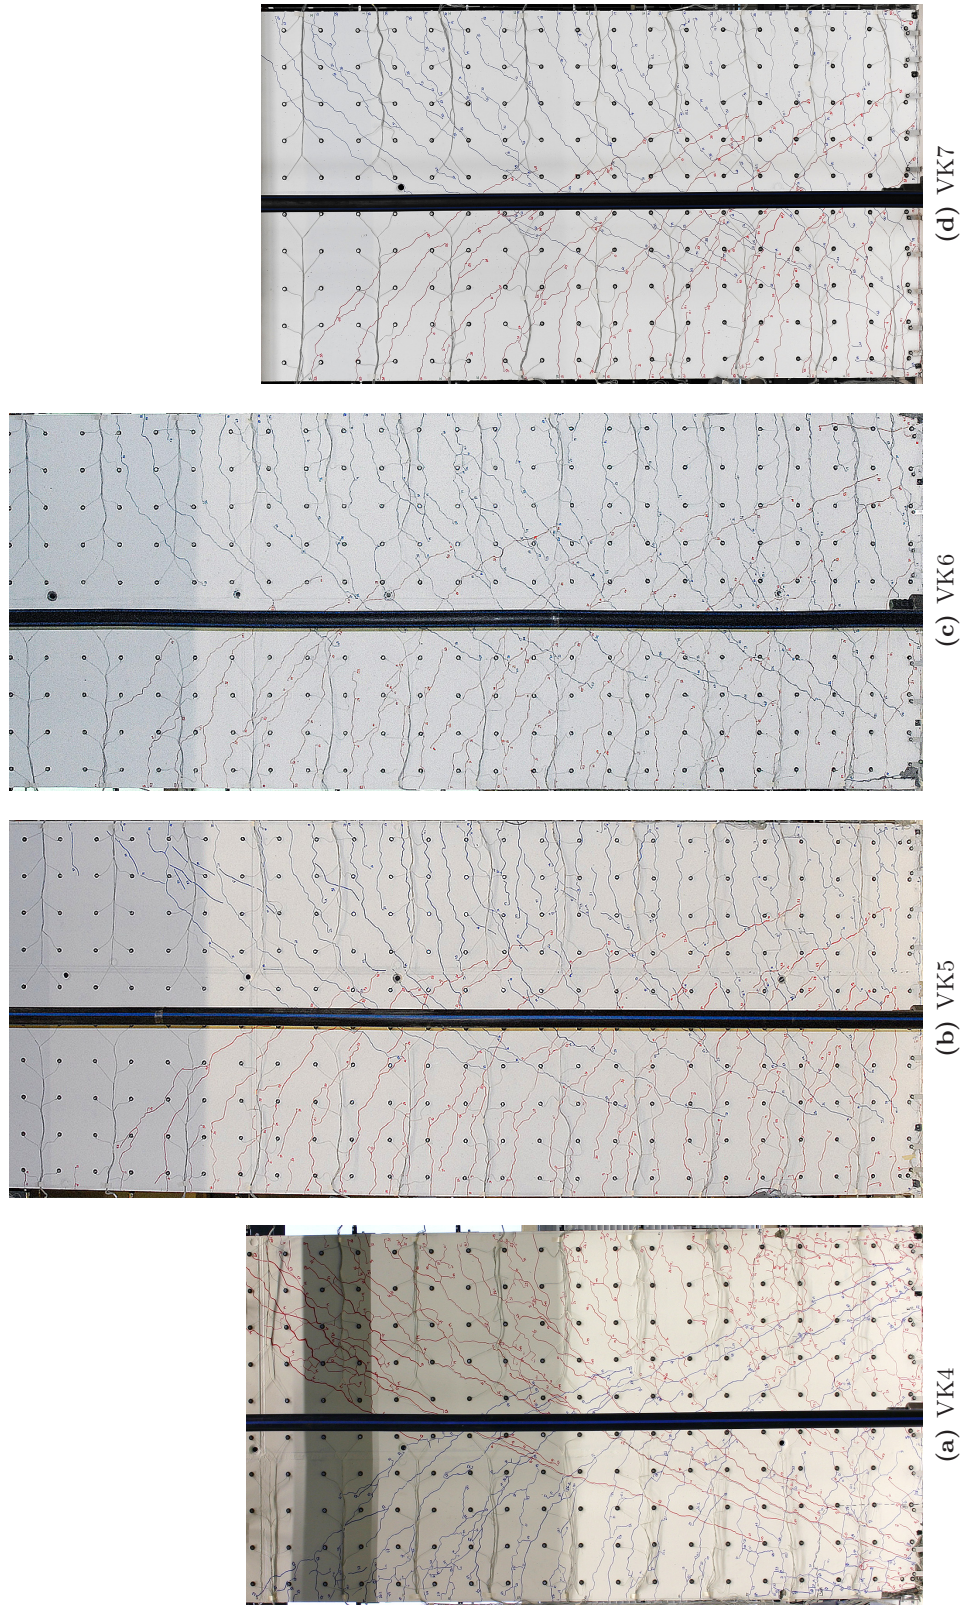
Pictures of all test units with fully developed crack patterns before lap splice degradation and spalling of concrete in the compression zones initiated.
